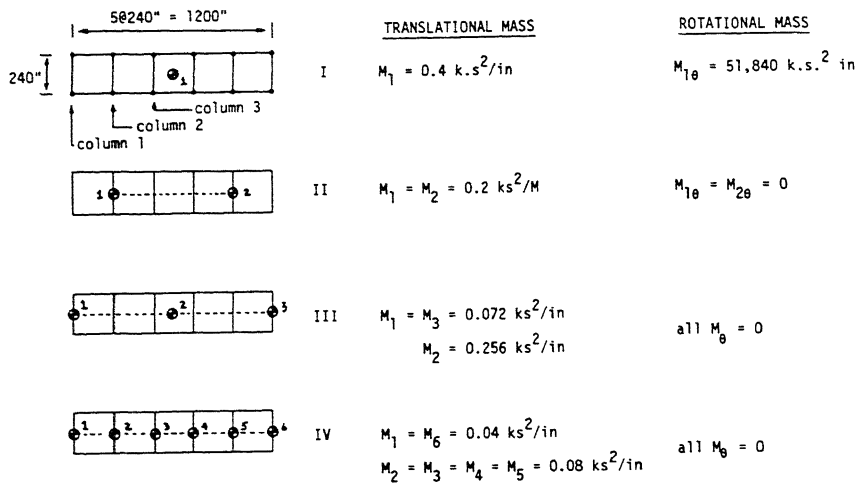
FLOOR DIAPHRAGM MODELLING
